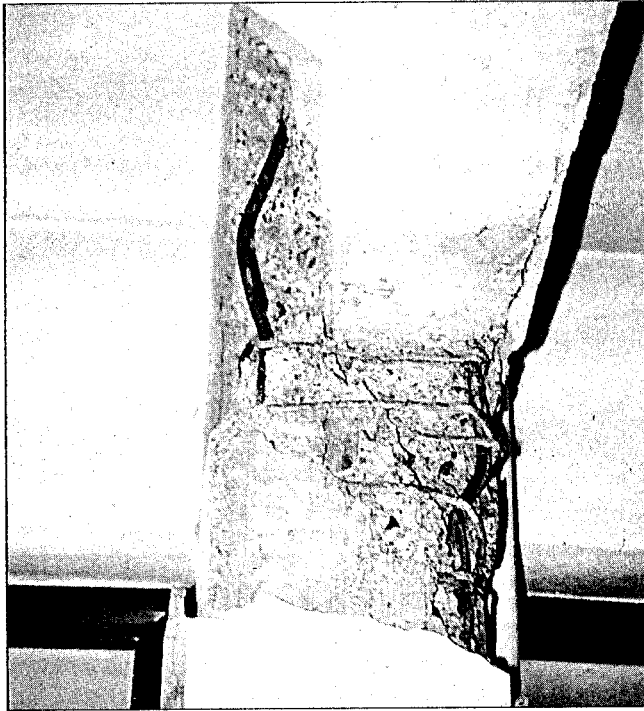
Lack of reinforcement detailing in a beam-column joint with beam offset.
